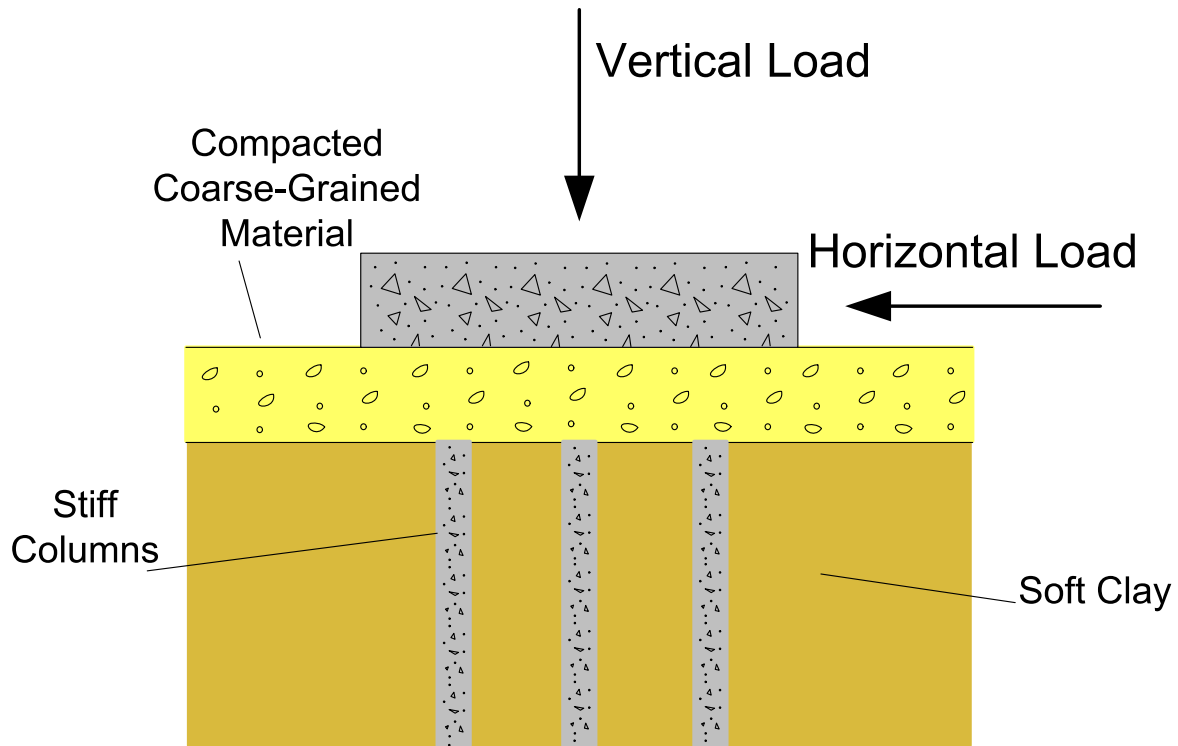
Shallow foundation supported by stiff columns subjected to vertical and horizontal loads.
